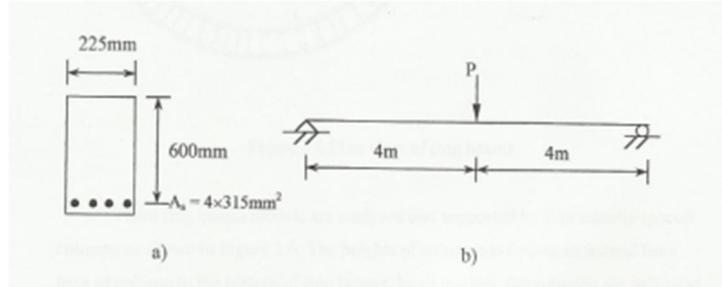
a) Beam cross section of control model 2, b) Structural boundary and loading condition for control model 2
